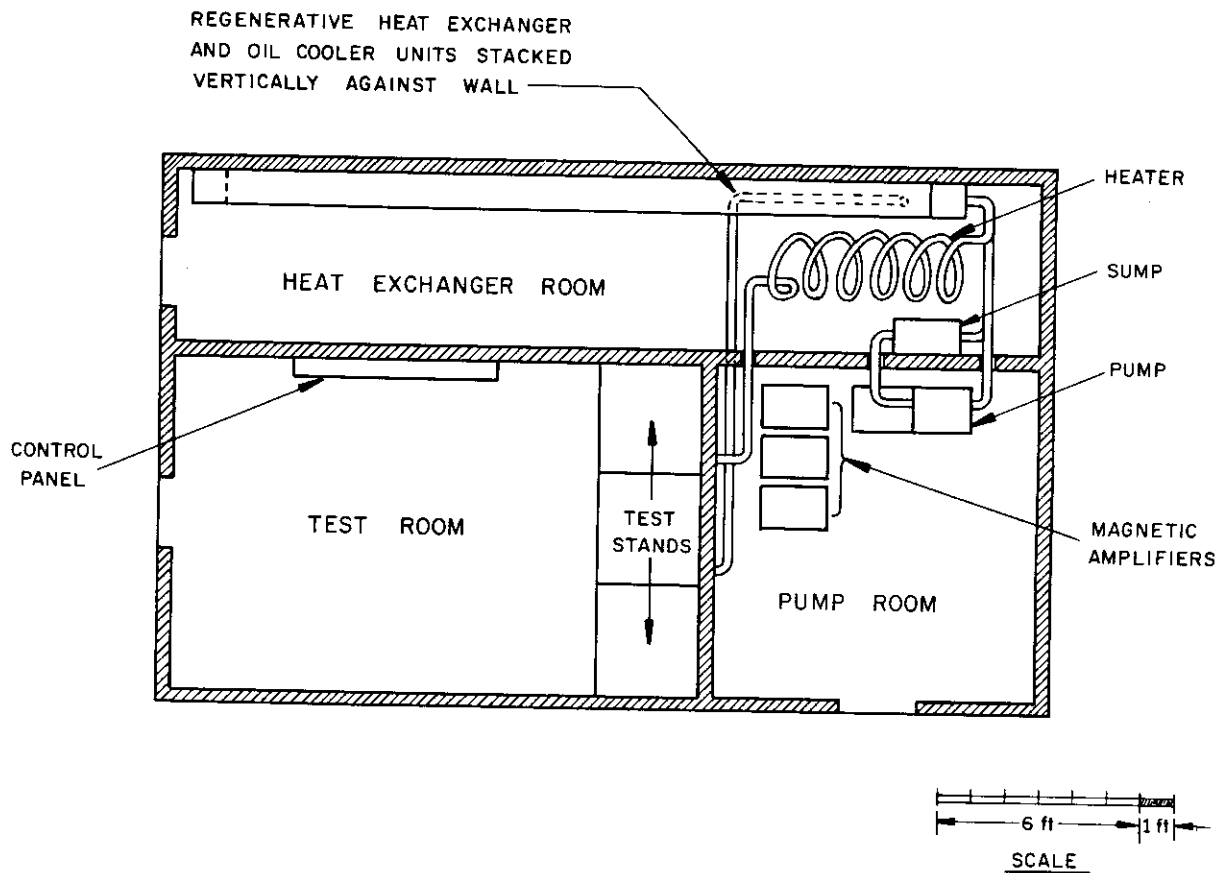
Suggested Floor Plan of High-Temperature Test Facility
